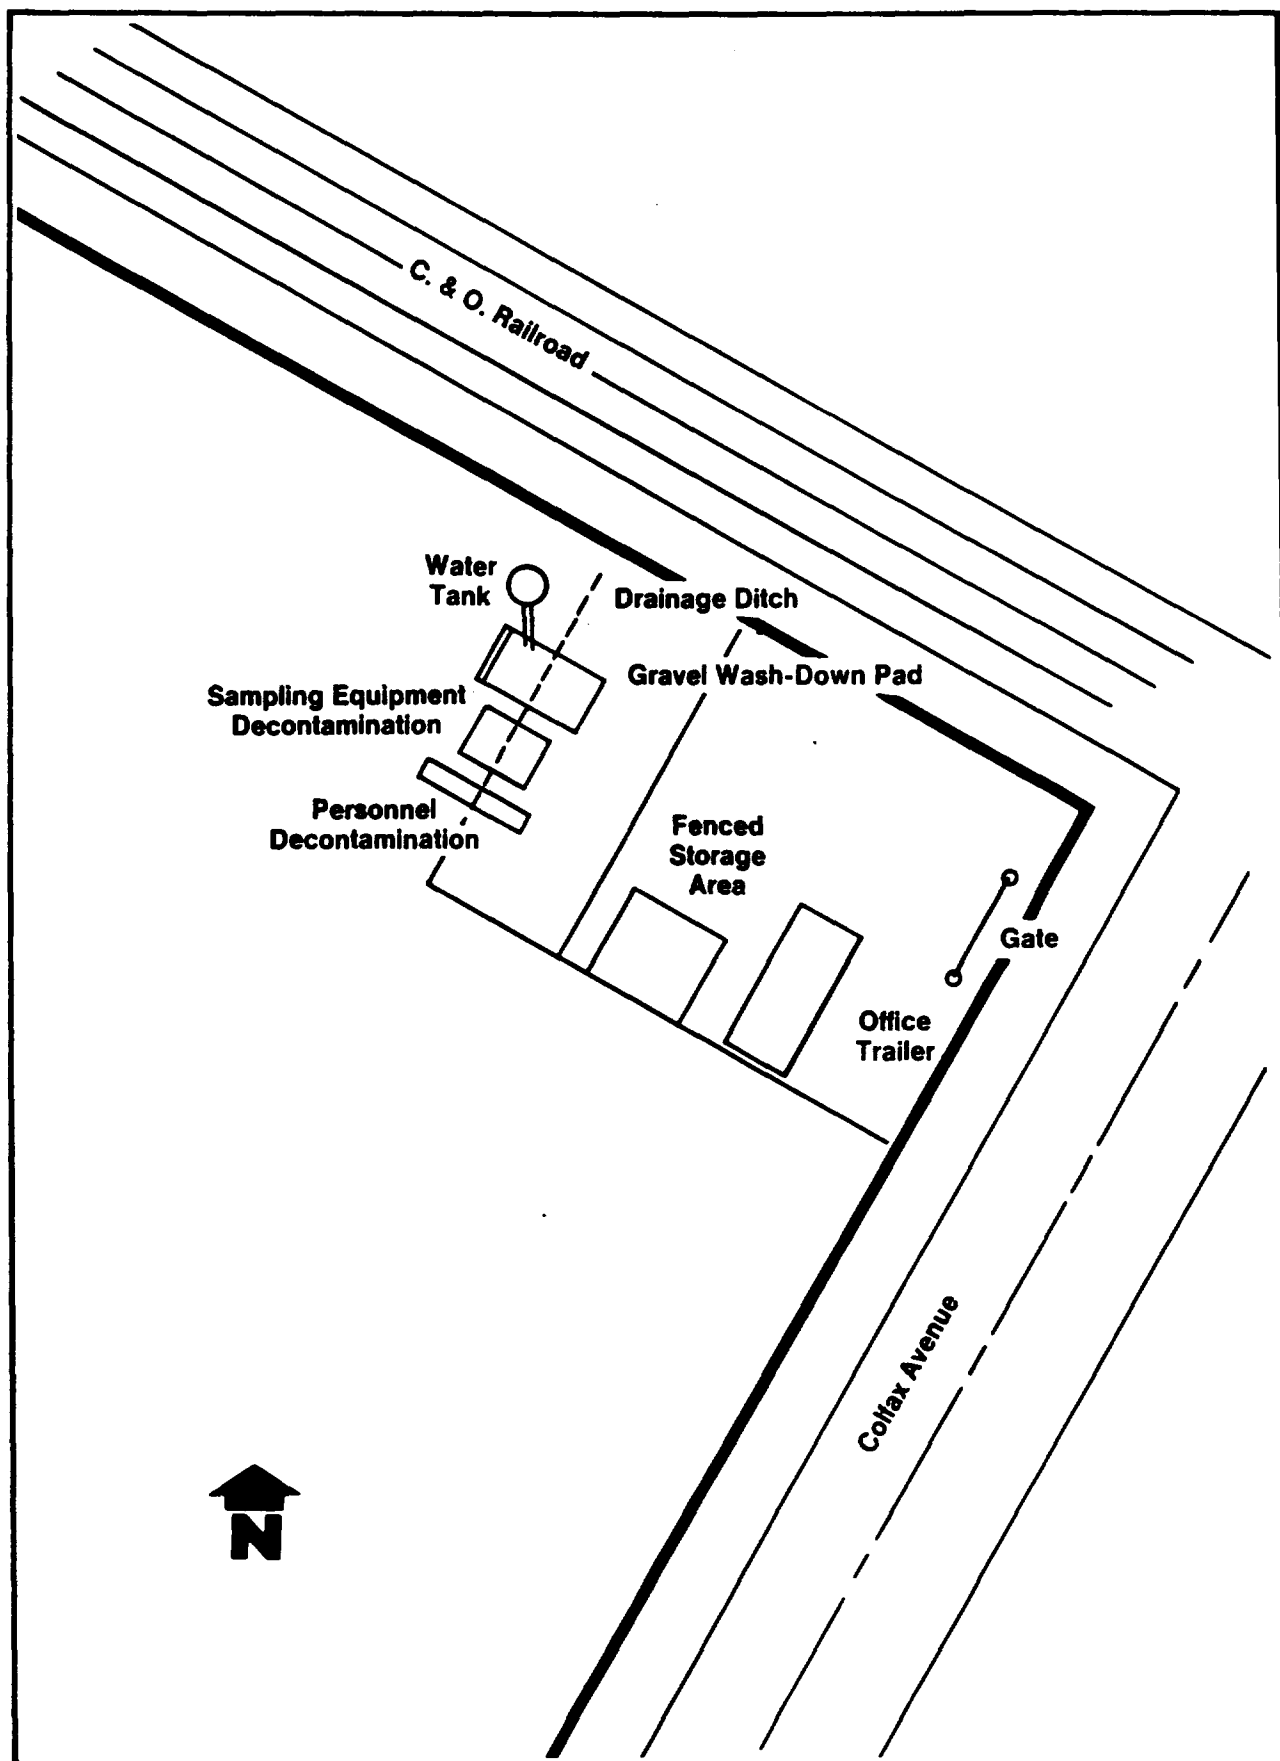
PRIMARY SITE FACILITY SCHEMATIC
